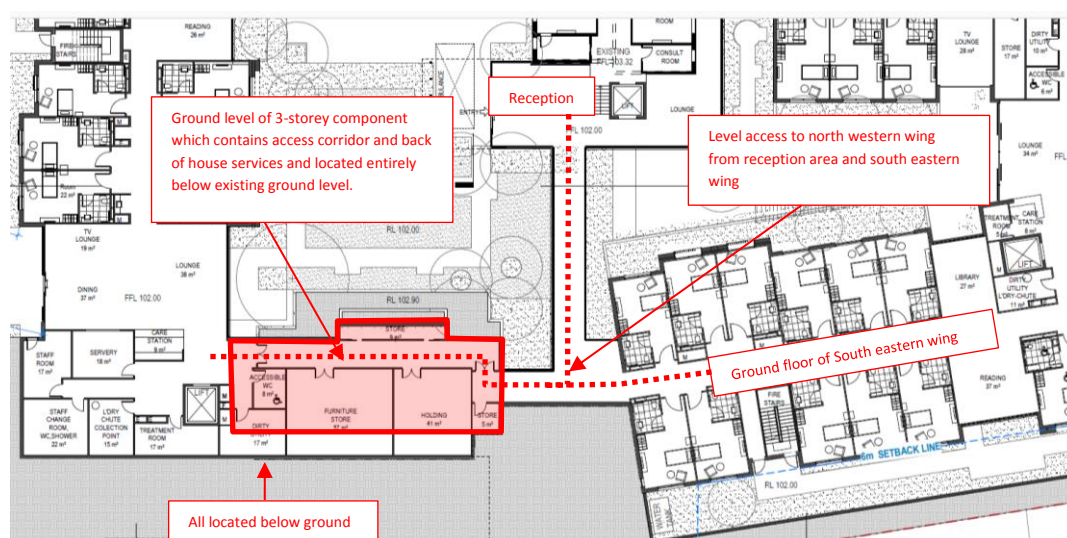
Extract from Ground Floor Plan illustrating ground level of 3-storey component. Source- Group GSA DA-2003
